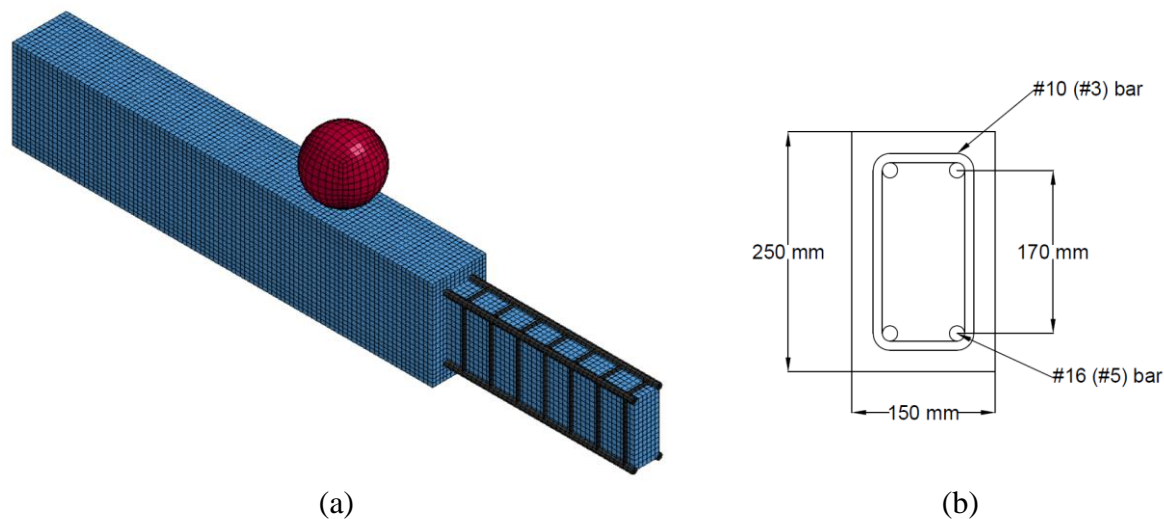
Details of the beam models for validating the reinforced concrete material model: (a) beam and hammer and (b) beam cross-section
